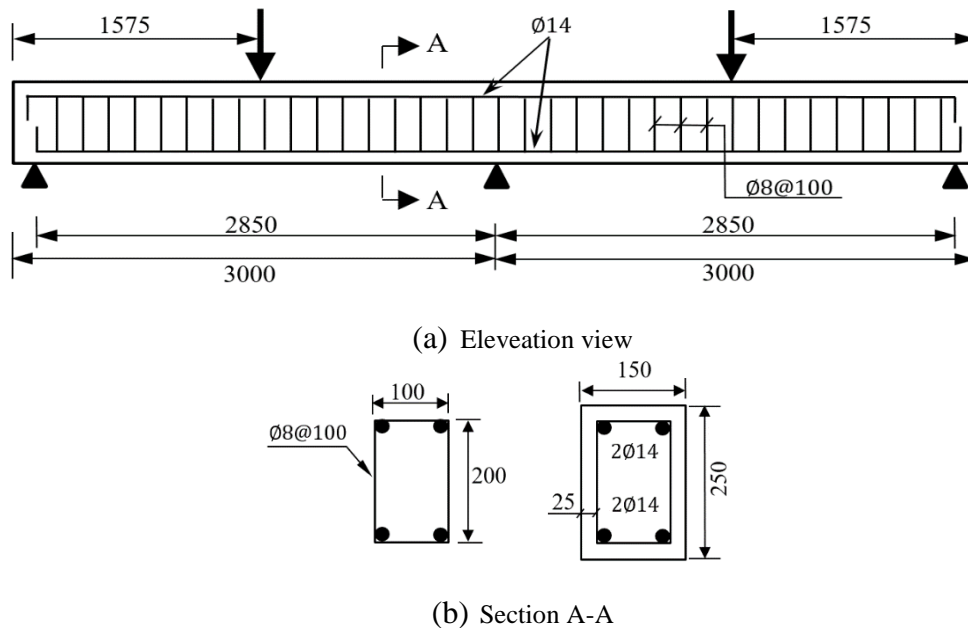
Dimensions, steel layout as well as support and load arrangement of tested beams. (All dimensions are in mm)
